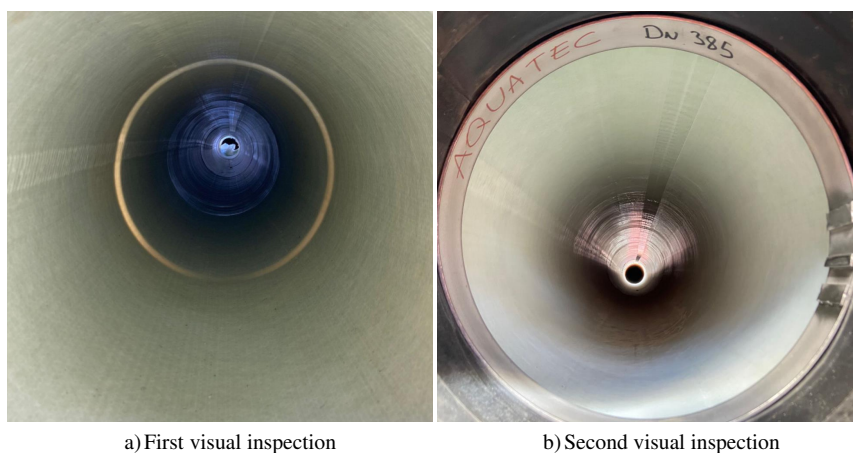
Visual inspection of the installed liner before (a) and after (b) the on-site tests.
